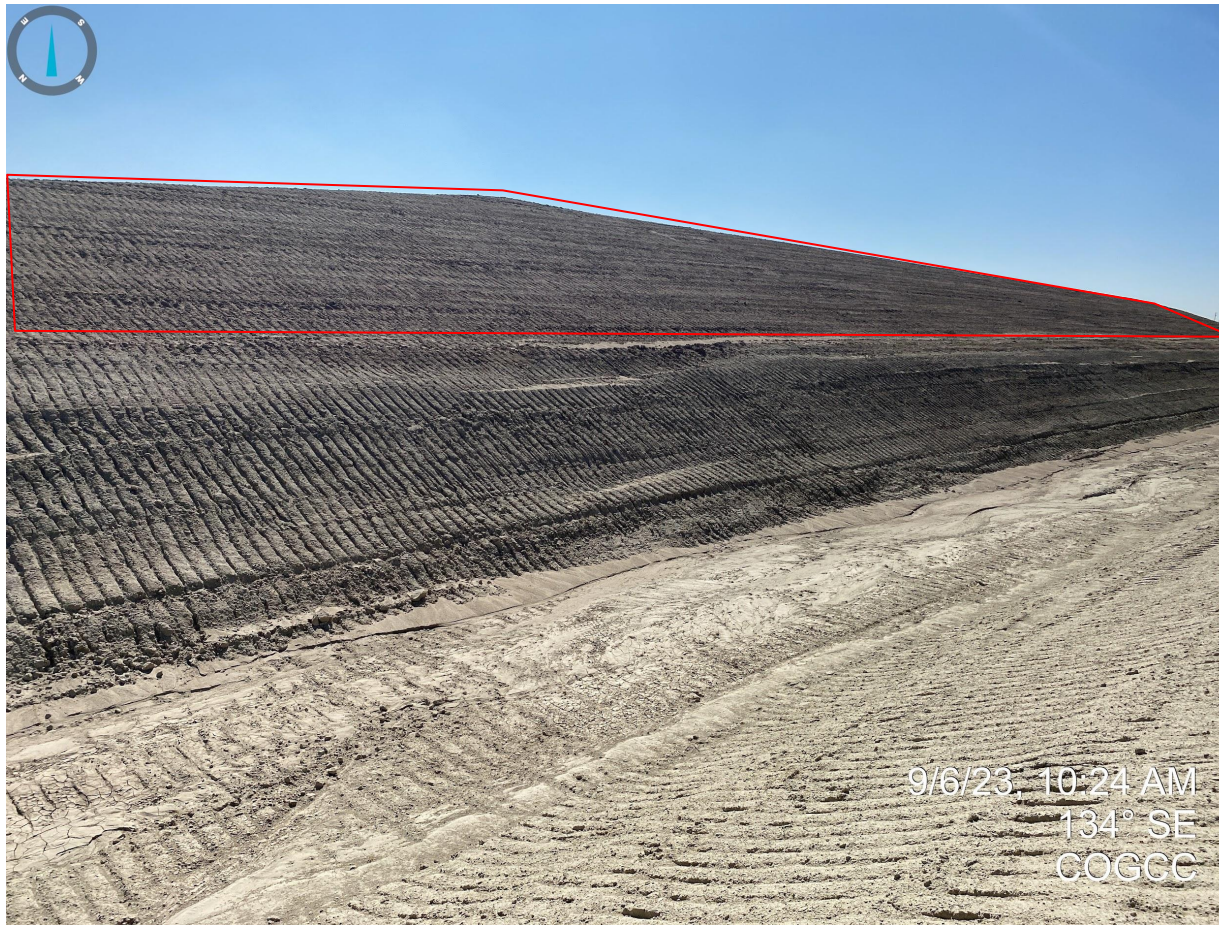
Taken from the northeastern portion of the topsoil stockpile. Photo (red outline) illustrates that the slopes of the stockpile are not properly stabilized as the equipment tracking is parallel to the slope or grade. Additional stabilization techniques are required to prevent degradation to the topsoil stockpile.
